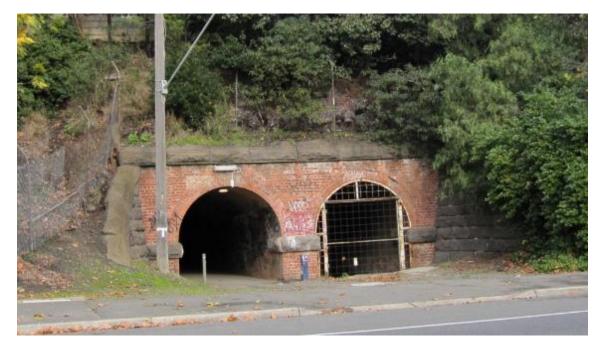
Pedestrian and creek tunnels, east end of railway reserve, as seen off Scott Parade
